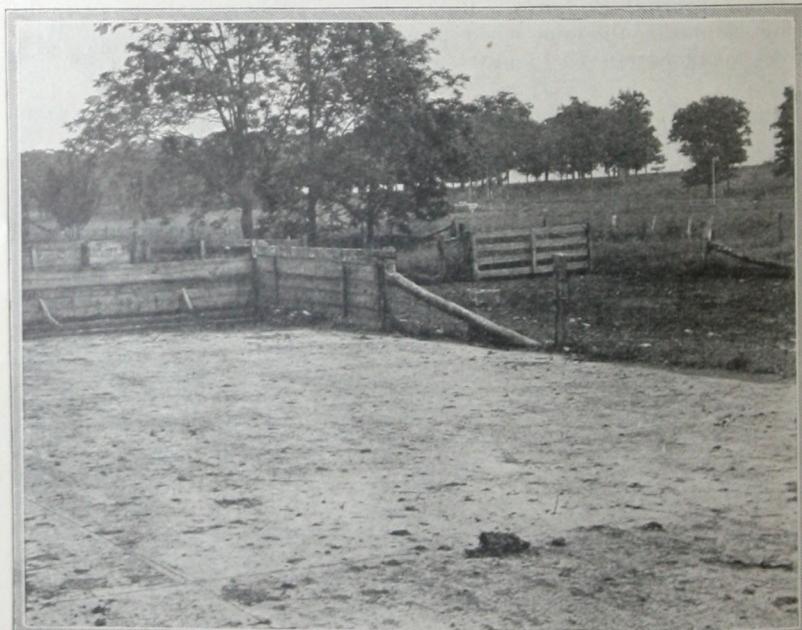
Corner of a Concrete barnyard pavement which is also used as a feeding floor. A clean, convenient, and economical place to feed animals and a great labor saver for the owner.
